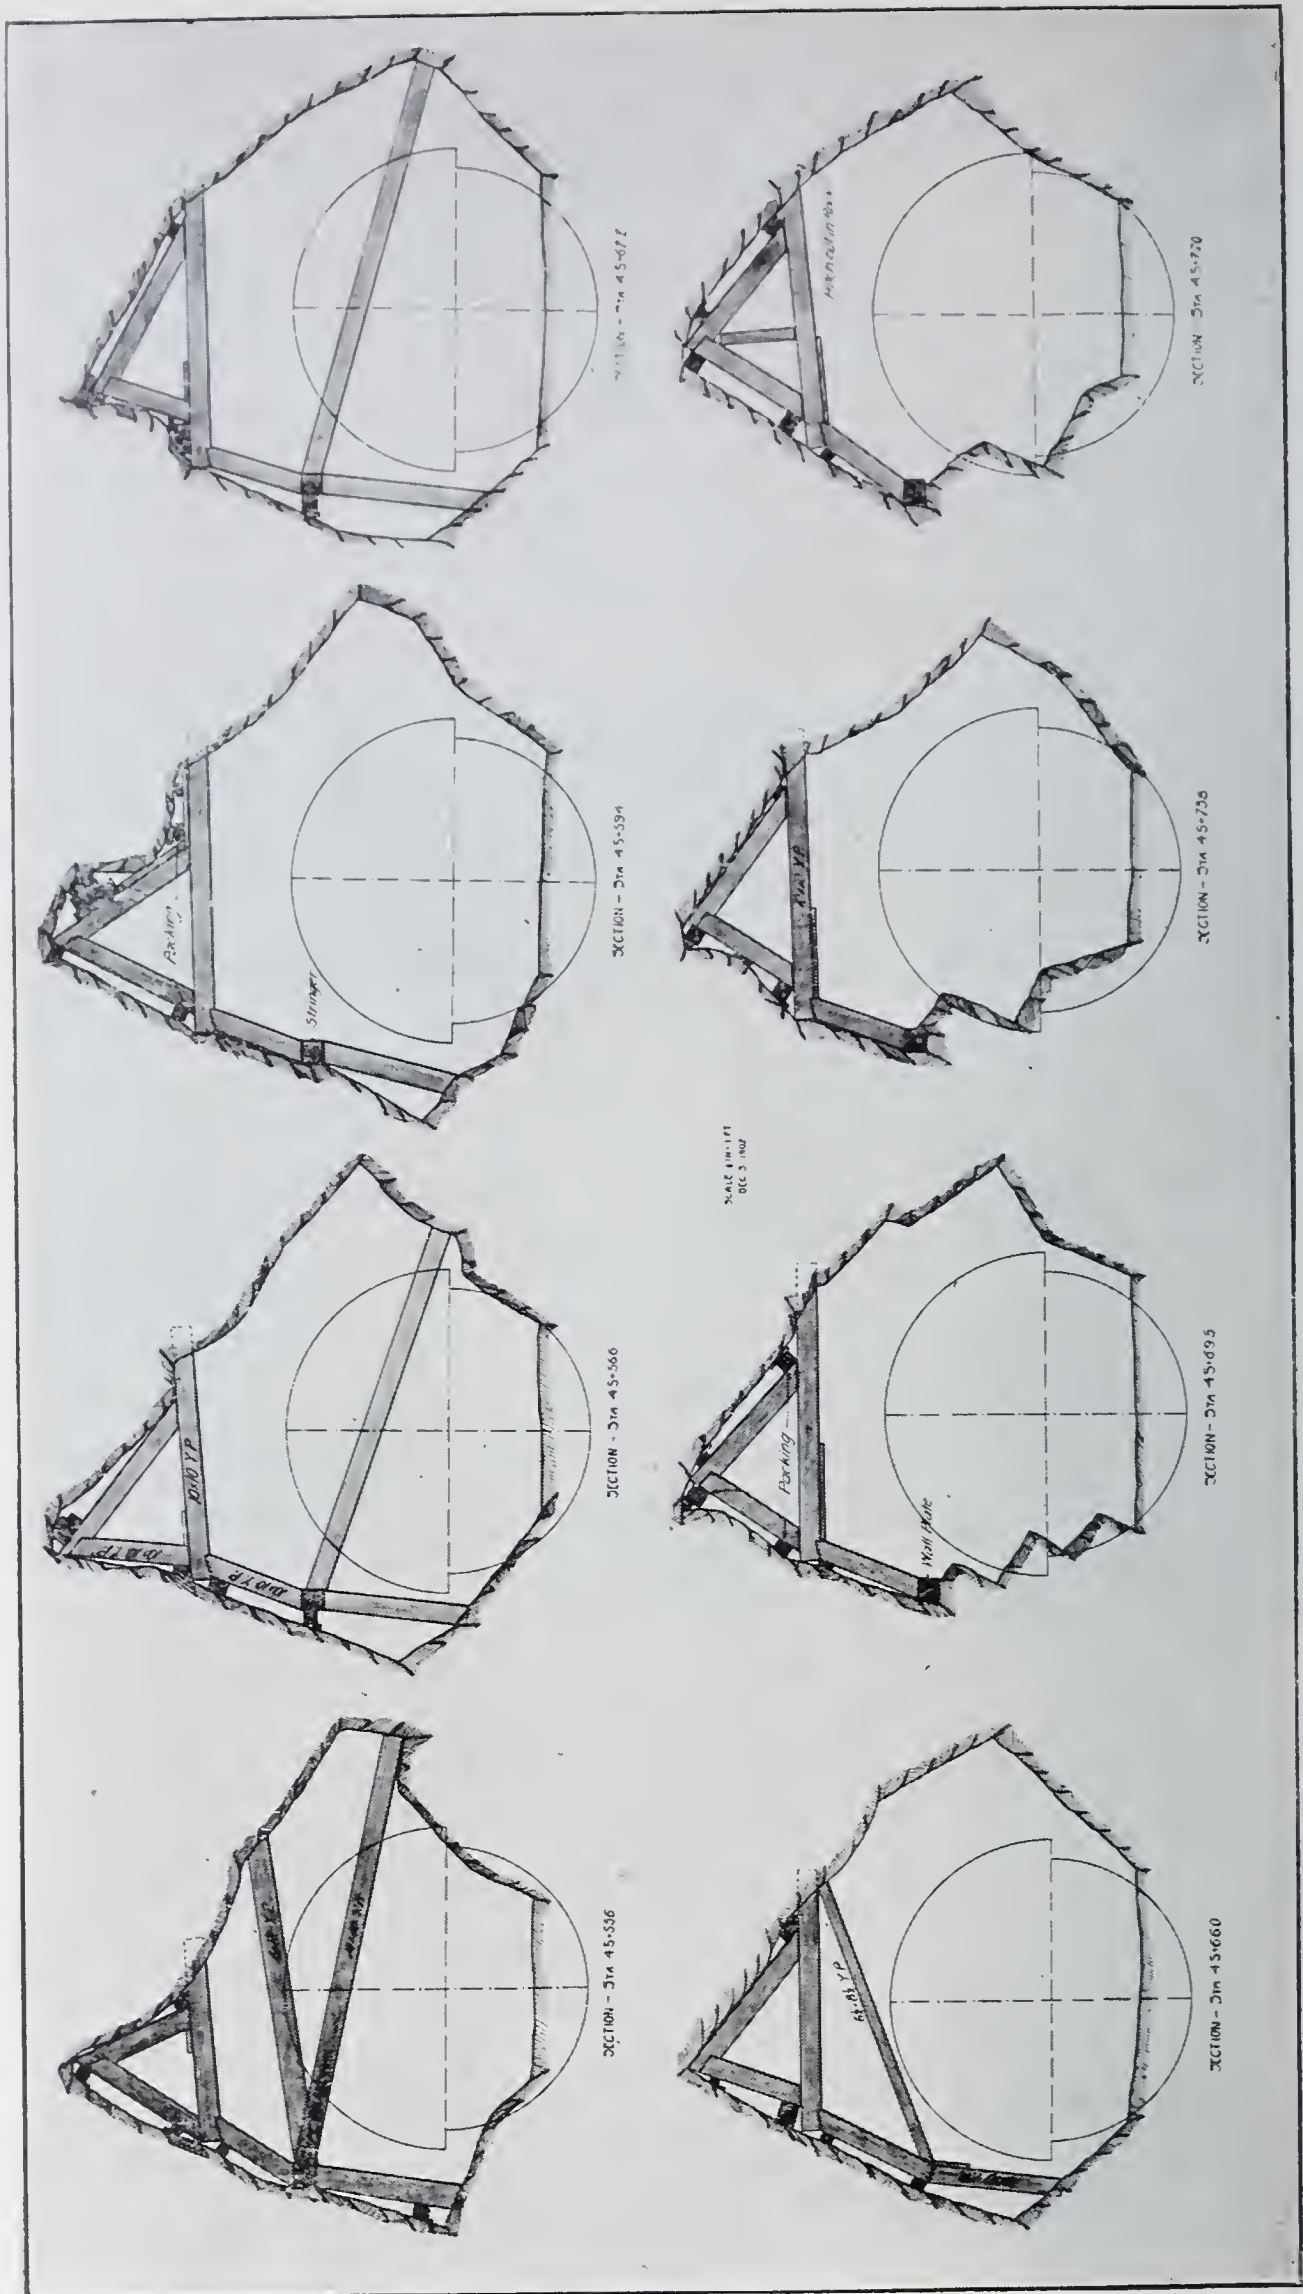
TORRESDALE CONDUIT—TIMBER SETS, NORTH HEADING, SHAFT No. 8.
